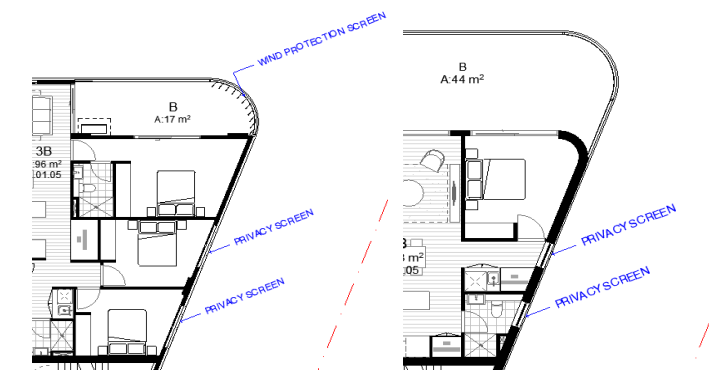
F1.6 Building A boundary condition at Level 5 & 6
